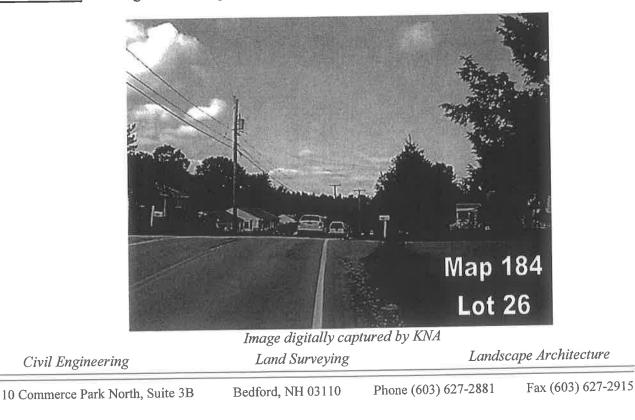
Looking East from Belknap Road at the existing site.
